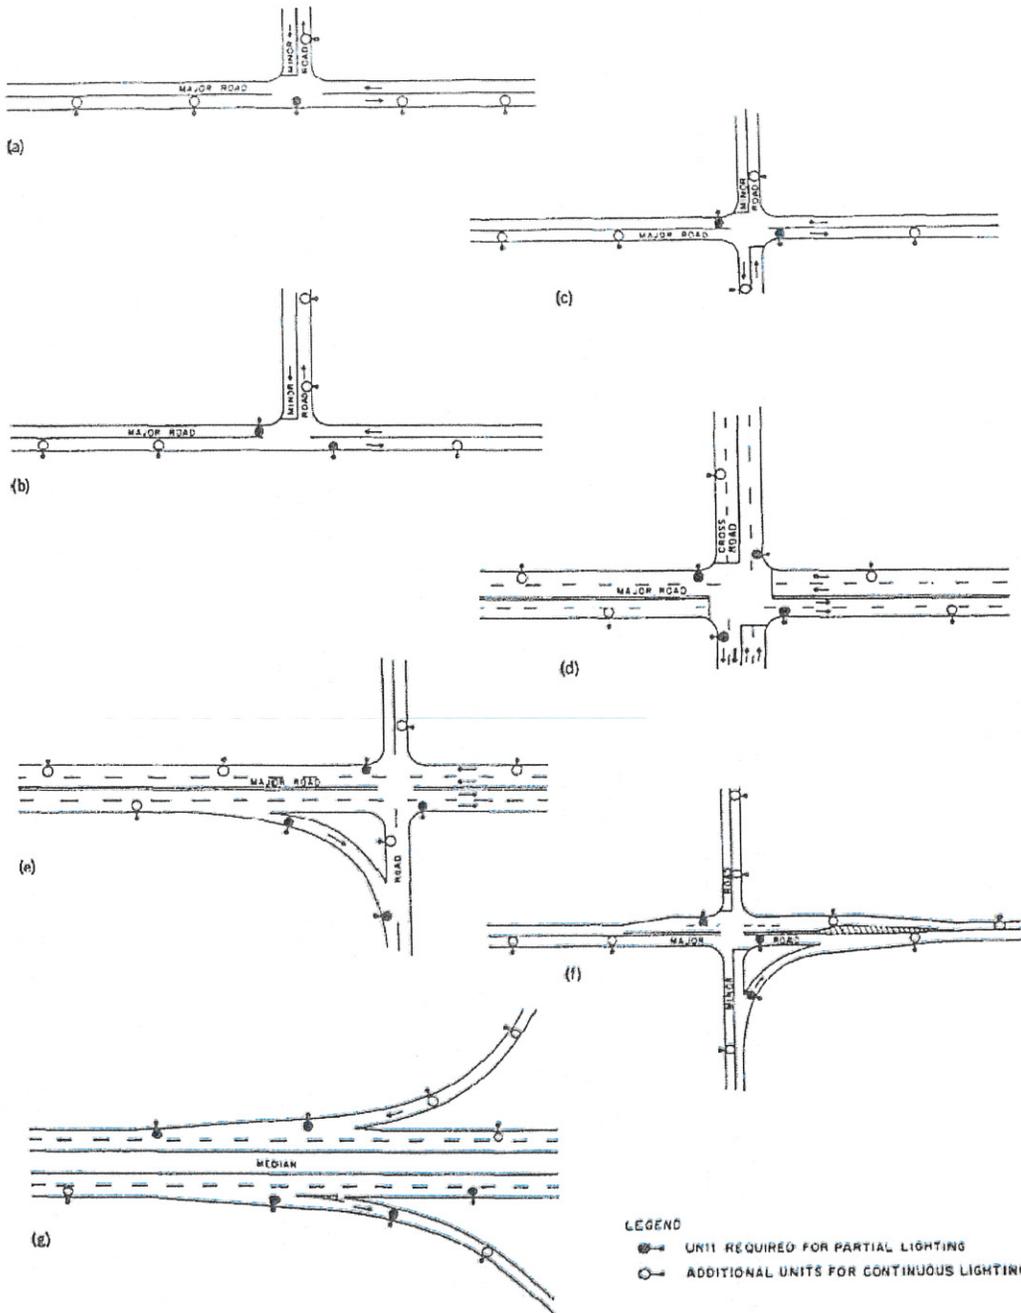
Examples of lighting configurations at intersections to provide illumination on vehicles and pedestrians in the intersection area, on the sidewalks, and on adjacent roadway areas for: (a) T-intersection; (b) T-intersection (alternate); (c) four-way intersection, two-lane road with two-lane sideroad; (d) signalized intersection, four-lane road with four-lane crossroad; (e) four-lane road with channelizing island; (f) intersection with channelizing island; and (g) typical acceleration and deceleration lanes at on and off ramps. Note: drawings are not to scale and the light locations shown are not to be considered complete in number or better than approximate in position.
